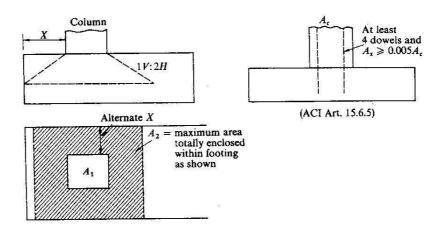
Method of determining allowable column pressure on footing and minimum column-dowel requirements.
